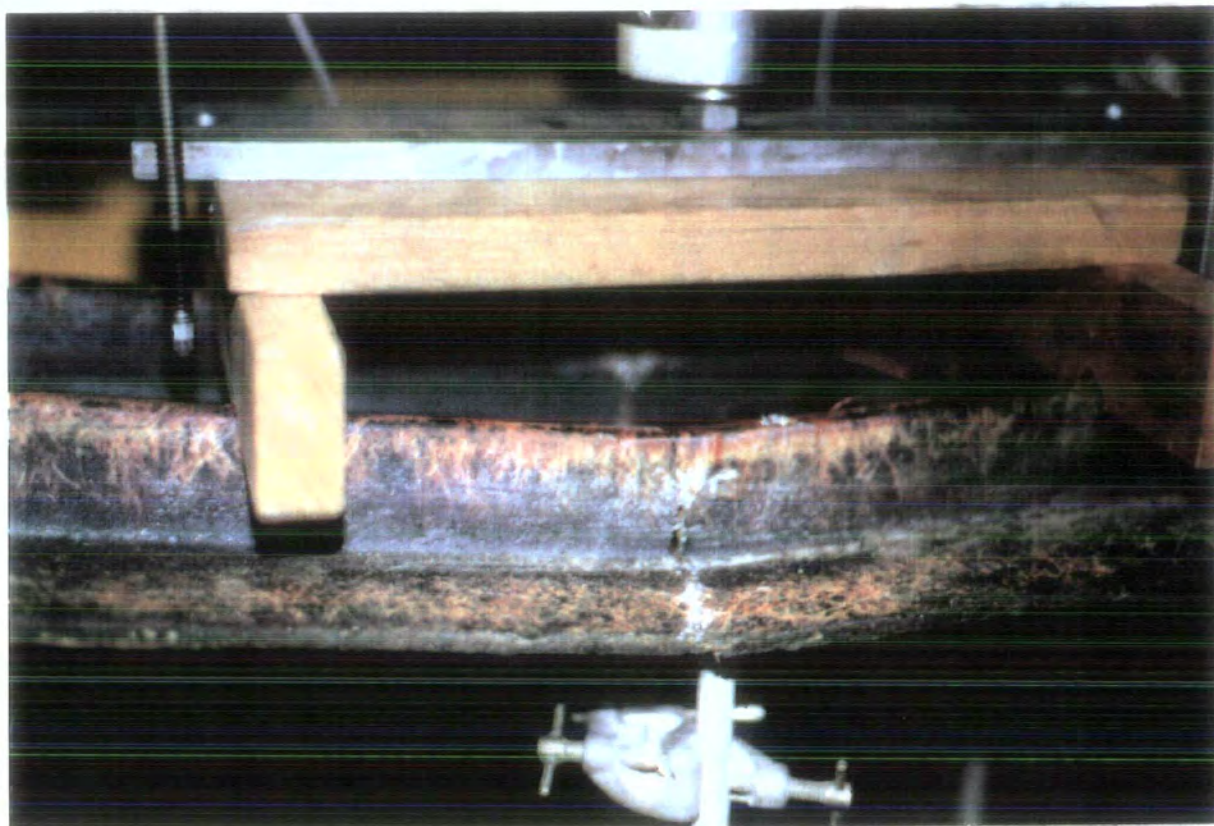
Failure mode of the internally reinforced b/deck panels (failure of phenolic concrete/laminated fibre glass mat in bending).
